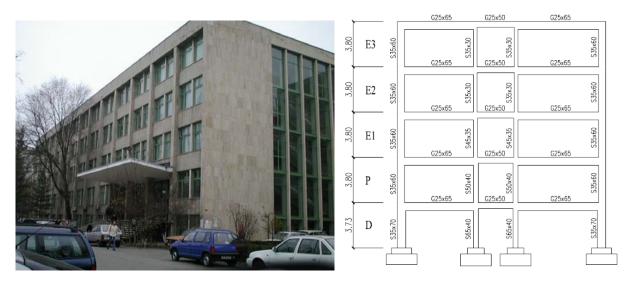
FCCIA building. Example of transverse frame (Lozinca, 2009)
